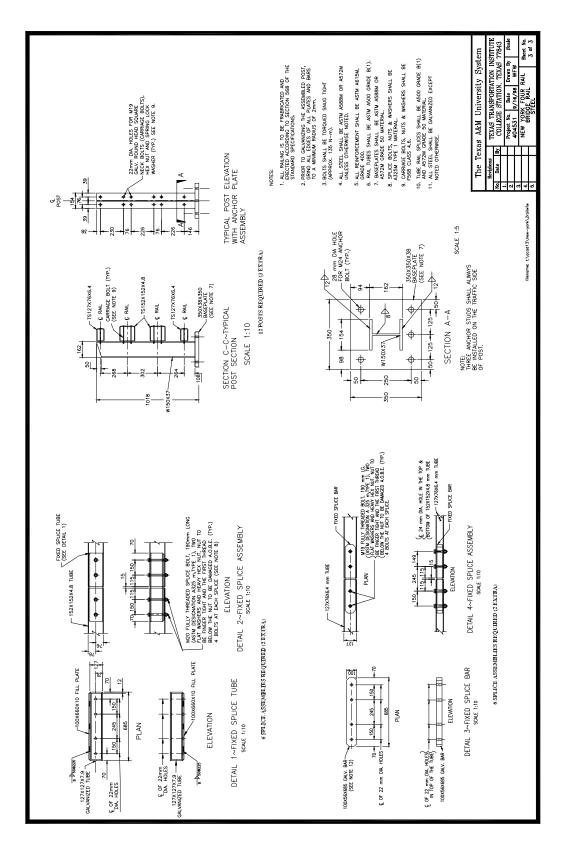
Details of the New York Four-Rail Curbless Bridge Railing used for test 404531-4 and 6 (continued).
